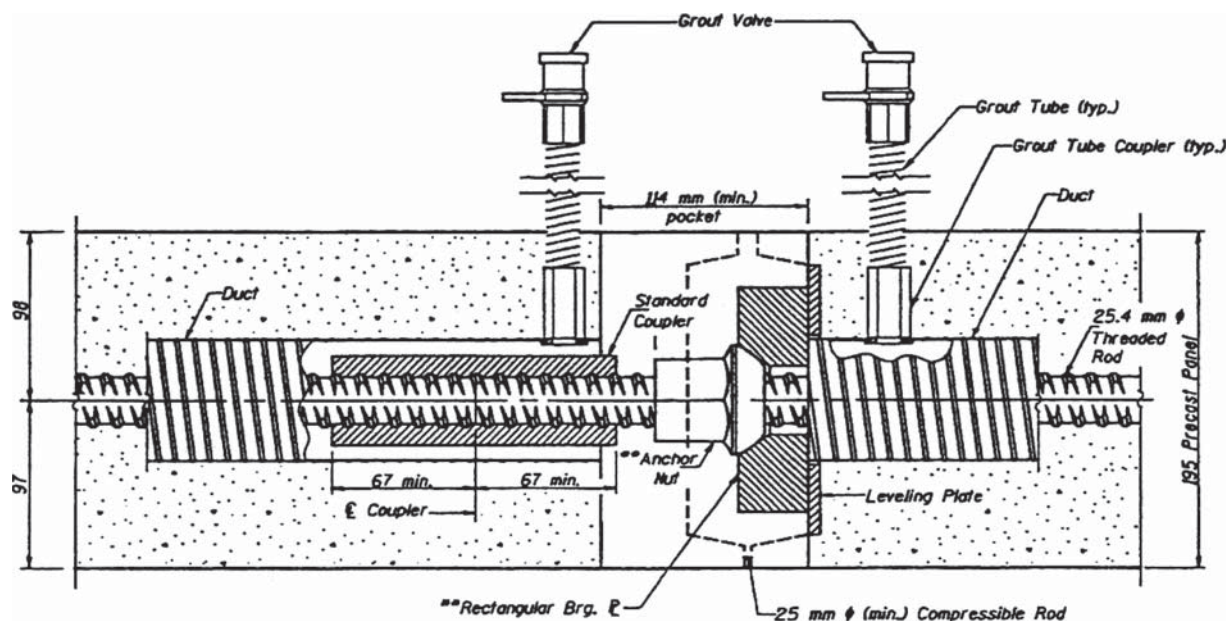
Posttensioning detail used on Bridge-4 constructed on Route 75, Sangamon County, Illinois.
